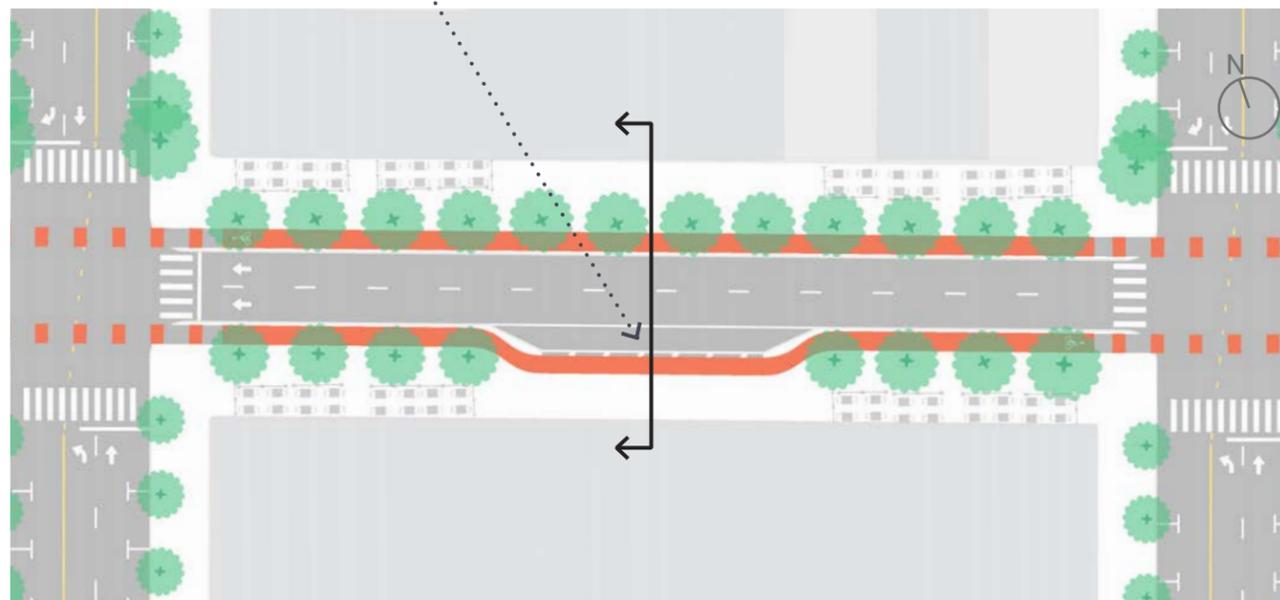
Typical Block Alternative - Bike Lanes, Parking and Loading within curb inset
